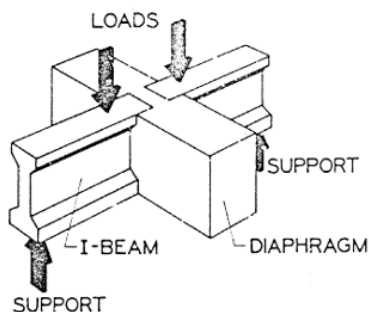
I-girder without slab extended strand test specimens (Salmons, 1974)
